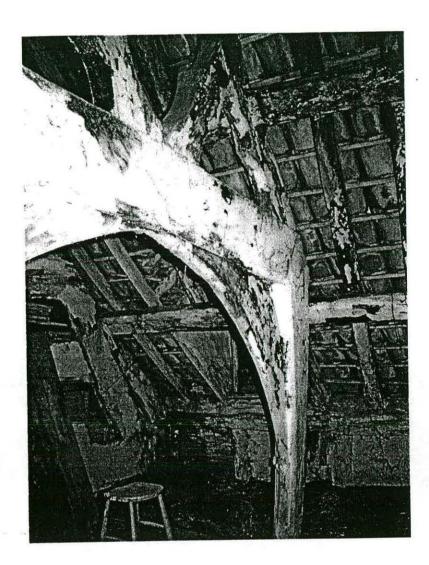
Internal elevation of E wall of S bay of 17th century N addition
